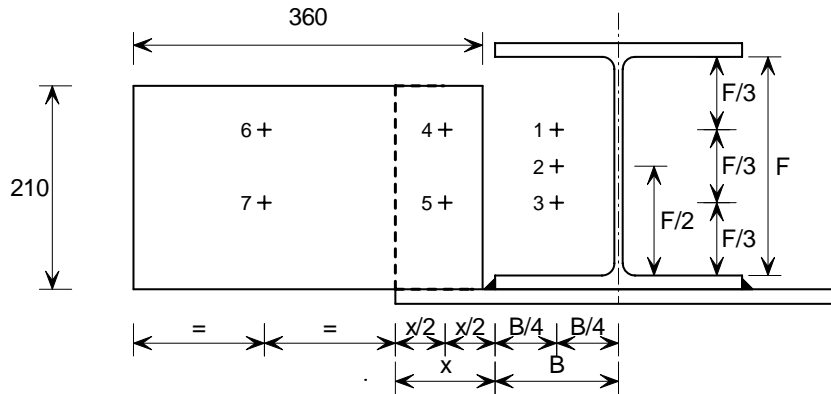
Thermocouples located in the ribs of the composite slab and in the concrete encasement around the steel section at Position 2.
